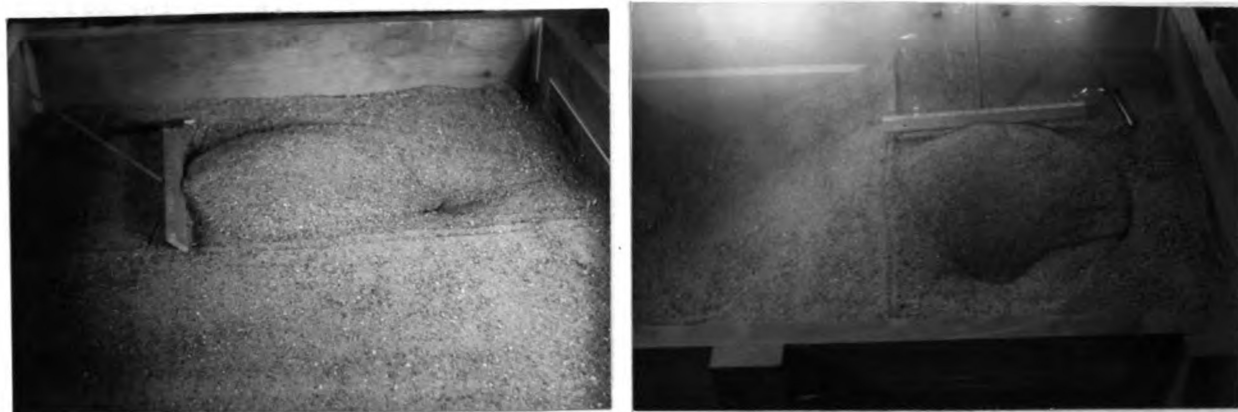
Views showing the typical pattern caused by pulling square concrete anchor.
